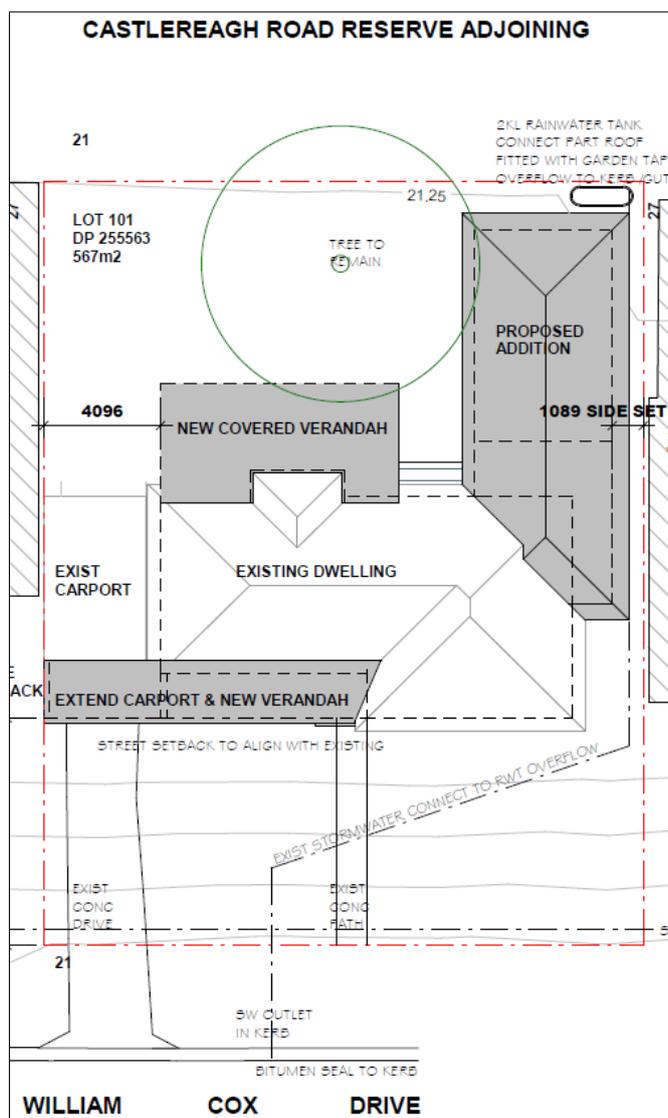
Proposed Site Plan showing alterations and additions to existing dwelling submitted with DA0302/23
